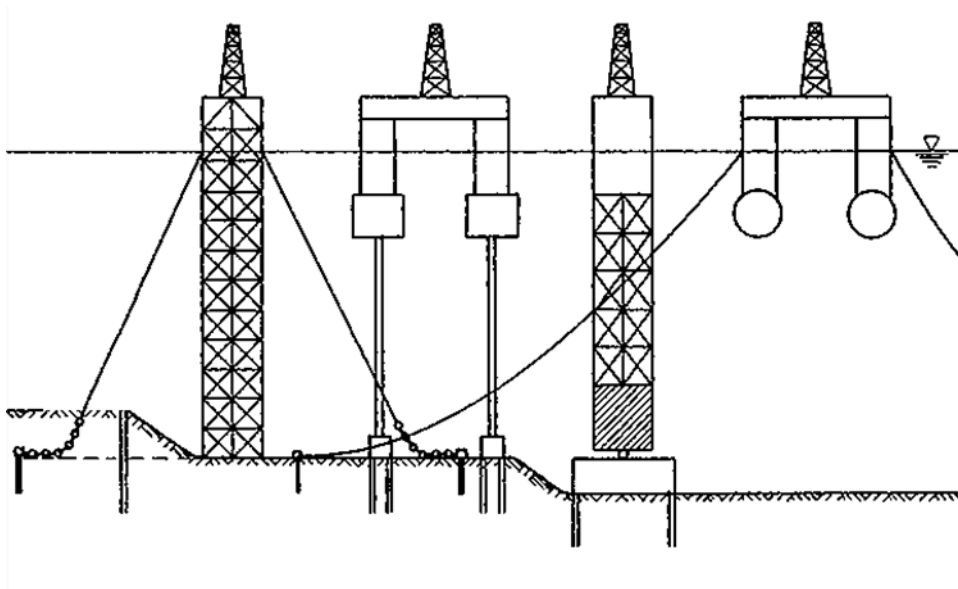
Guyed tower (left); Tension leg platform; Articulated tower; Semi-submersible (right), adapted from Lesny (2010)
